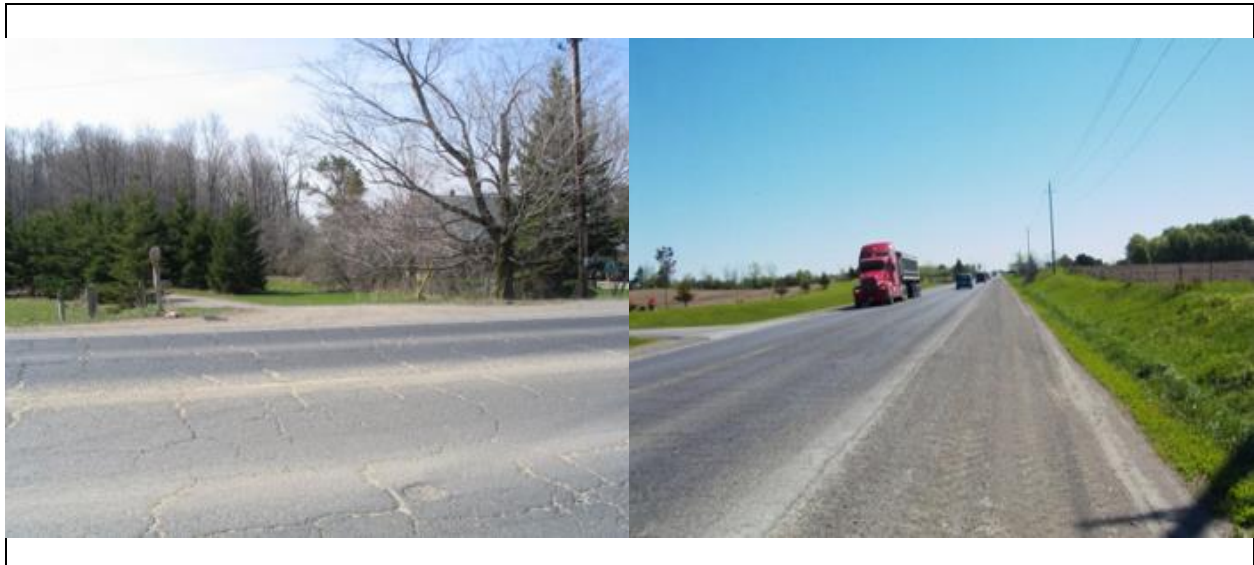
Typical Pavement and Shoulder Condition Prior to Recycling
